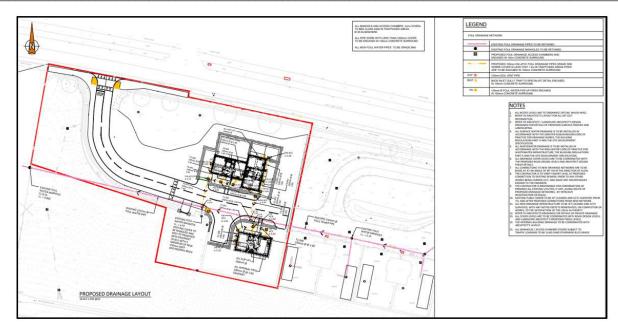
Proposed Drainage Layout for the Project (excerpt from Technical Drawings, Appendix I)
